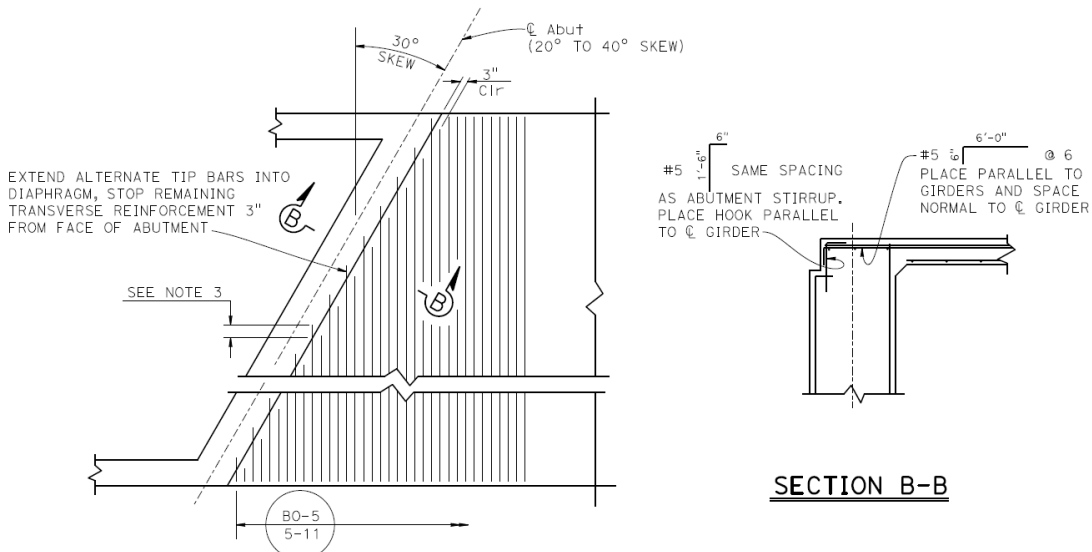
Transverse Deck Reinforcement Details at Abutment (20° to 40° Skew)
